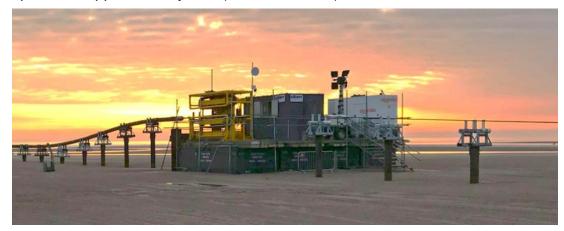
Example roller boxes and intermediate pulling platform installation (image courtesy of Boskalis)
